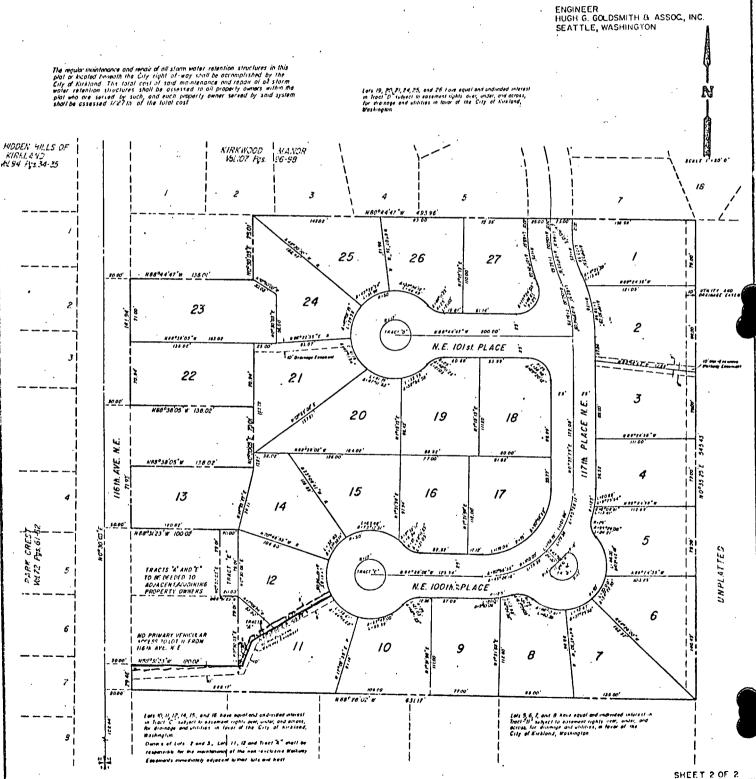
EXHIBIT "D" FINAL PLAT LINENS KIRKWOOD MANOR II FINAL SUBDIV. T-SUB-R-79-117(P)
